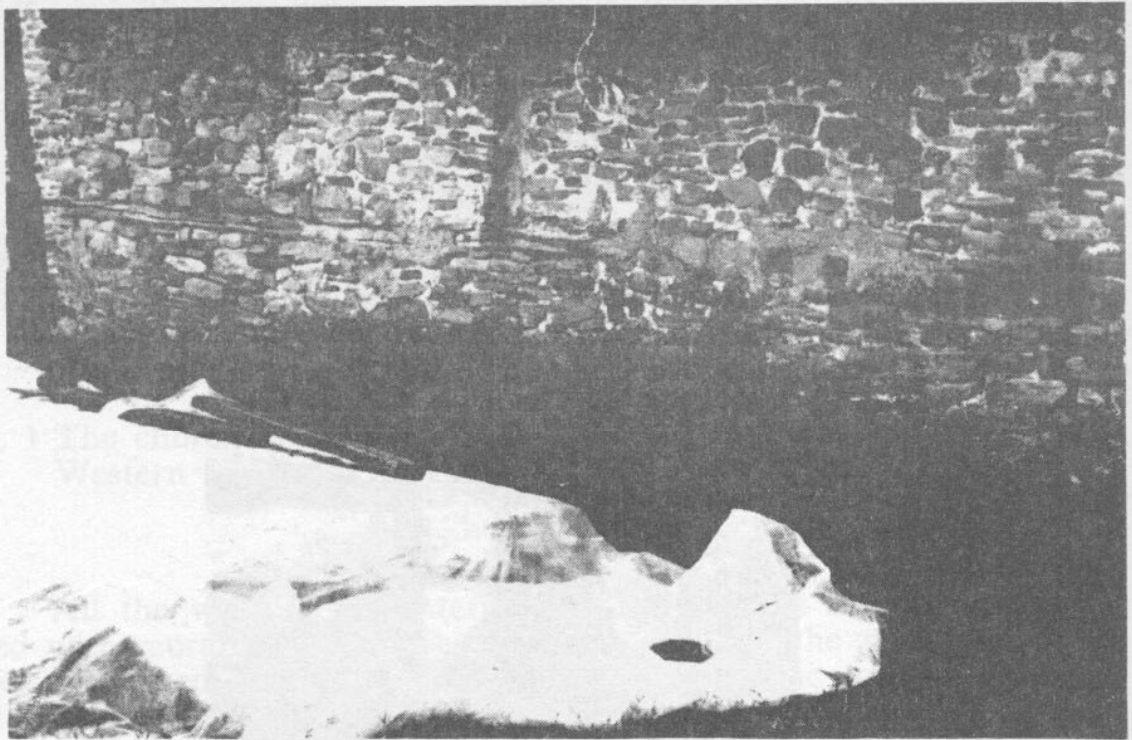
Northern facade. Destroyed tie beams, moisture and cracks are some of the problems.
